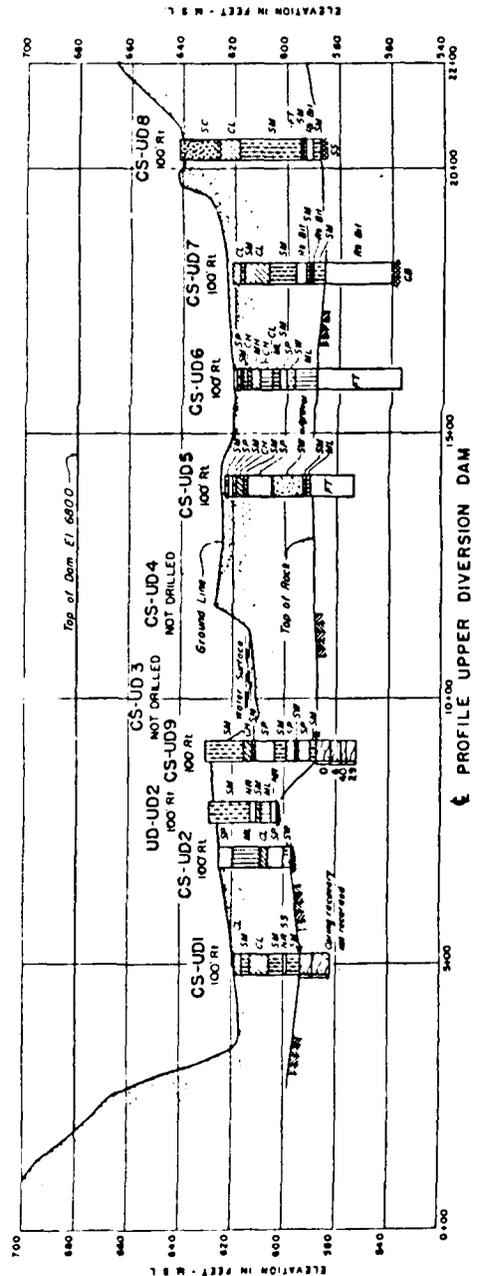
Cross section through Clemson Upper and Lower Dams showing foundation soil types prior to construction (from U.S. Army Corps of Engineers, 1960)
